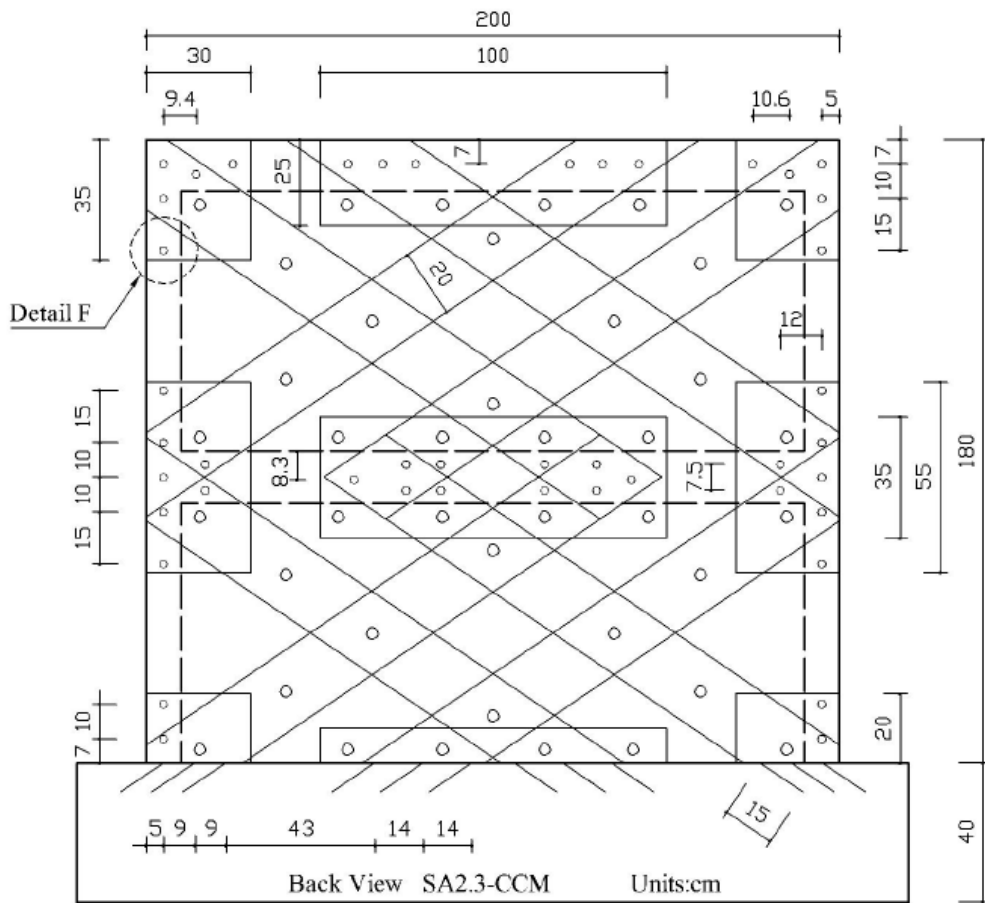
Back view of strengthening details of specimen SA2.3-CCM
